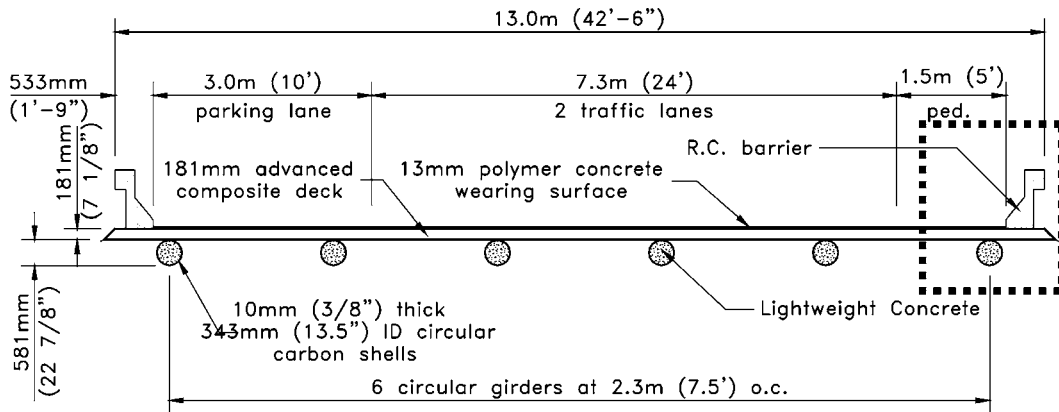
Cross section of *Kings Stormwater* bridge [ZKHS04]
